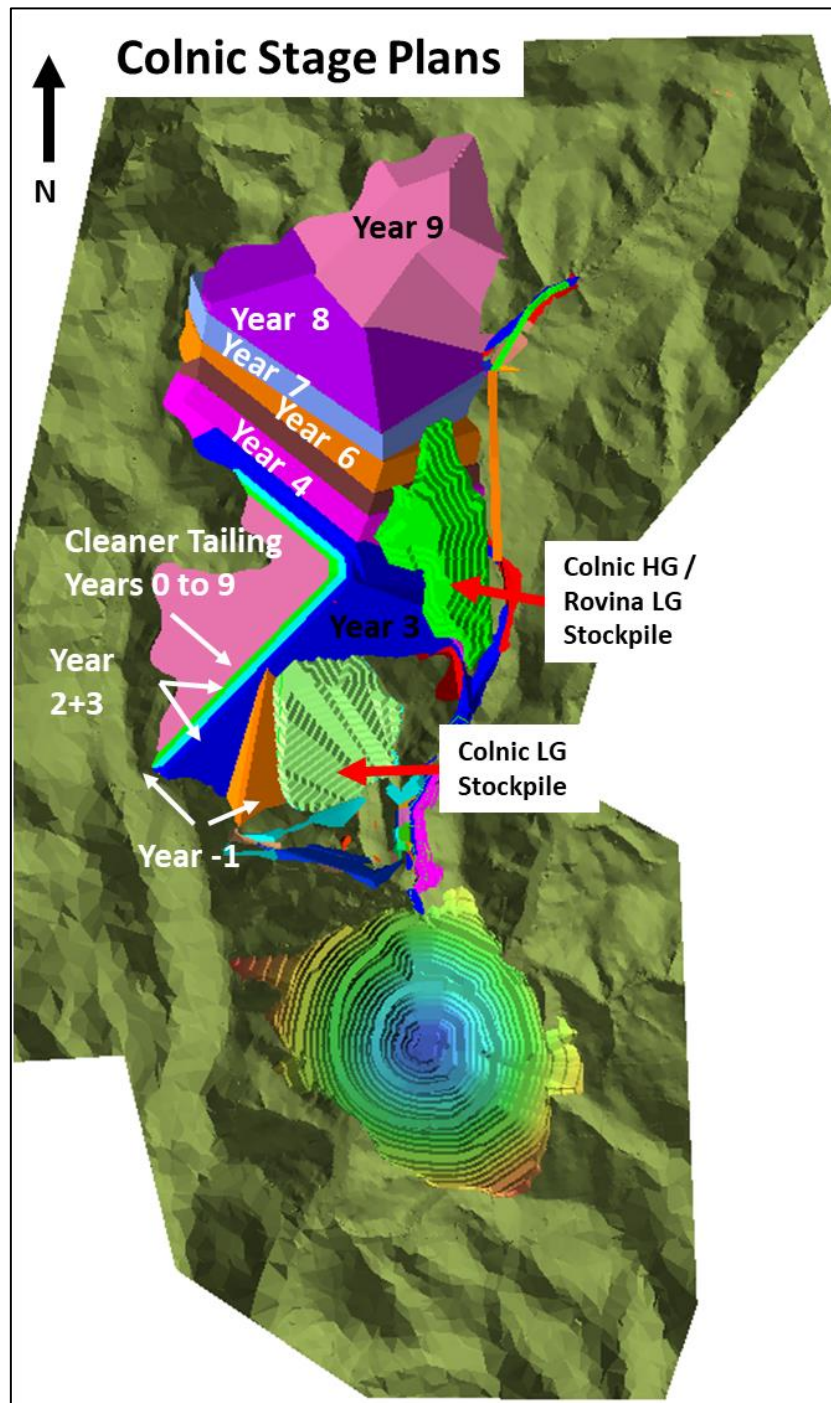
Colnic Pit and Co-Disposal Storage Facilities and Stockpiles
